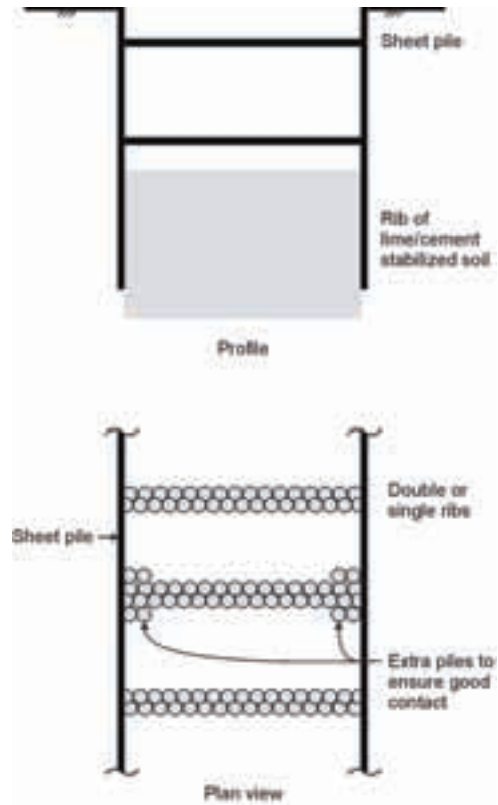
Typical layout of Lime-cement stabilised ribs in excavations (after Karlsrud, 1999)
